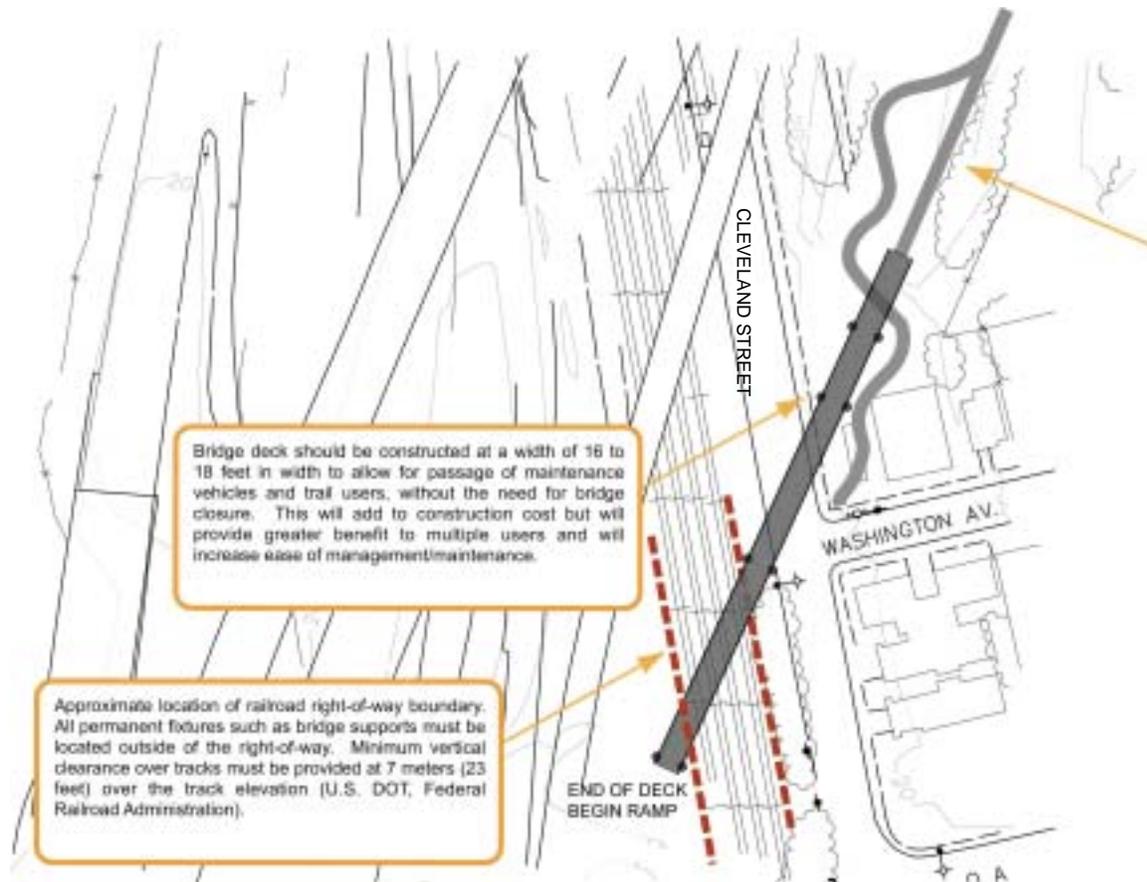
DETAIL D. PROPOSED TRAIL OVERCROSSING LOCATION (PLAN VIEW)
